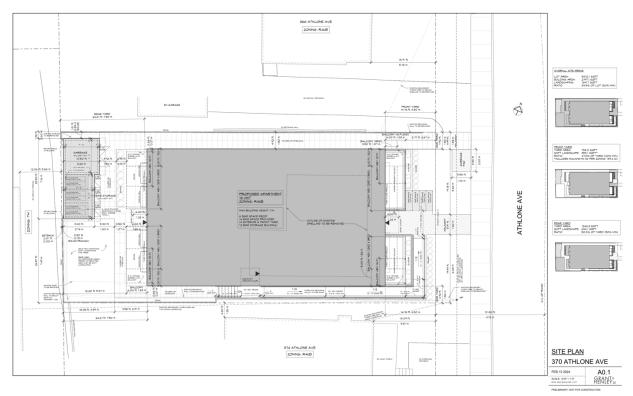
Proposed Site Plan, Colour (Source: Grant Henley Design Group)
